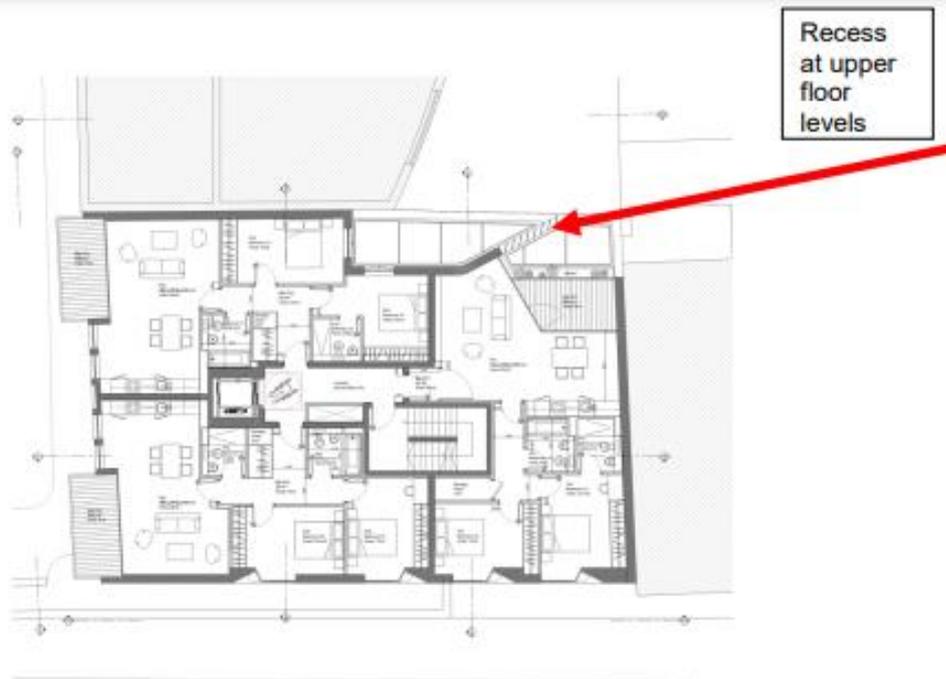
Proposed Second Floor Plan highlighting recess at the 2nd to 4th floor levels
